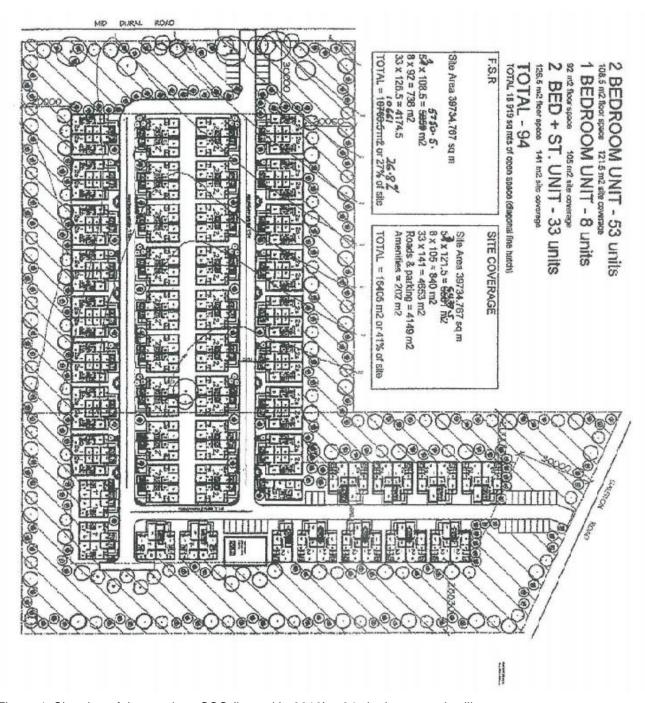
Site plan of the previous SCC (issued in 2010) – 94 single-storey dwellings.
